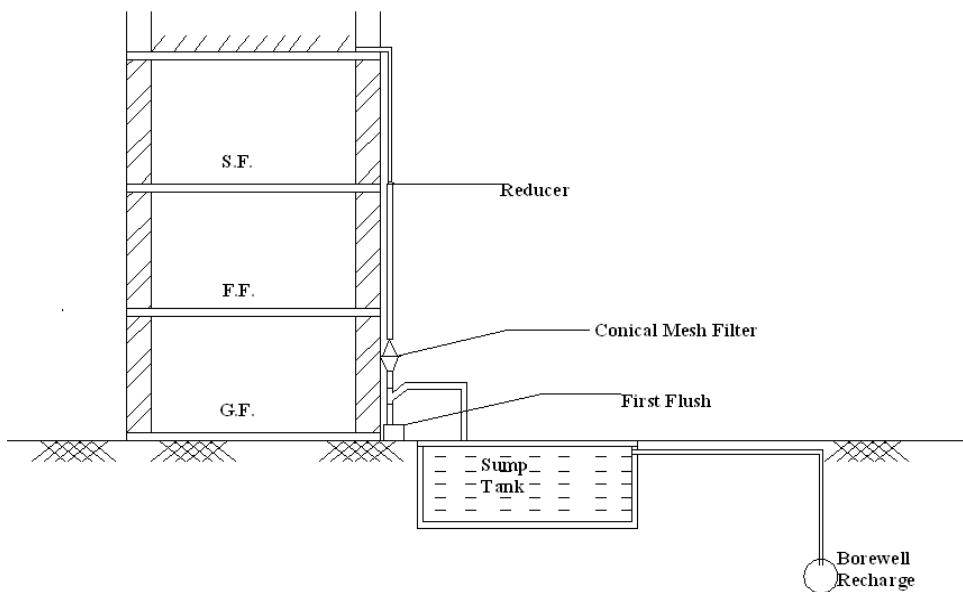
Schematic representation of the proposed rainwater harvesting structure
